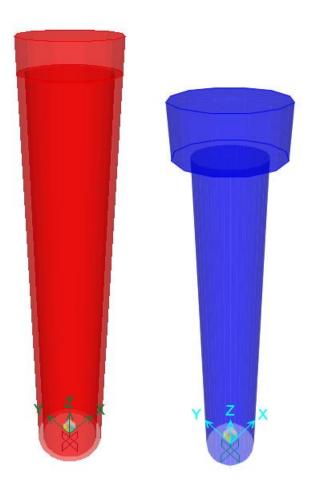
3D views of Ringhal Khad bridge pier and Dhaleswari bridge pier
